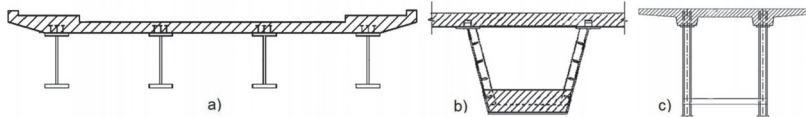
a) multi-girder section, b) double composite section for large span bridges above intermediate support, c) truss composite section [18]
